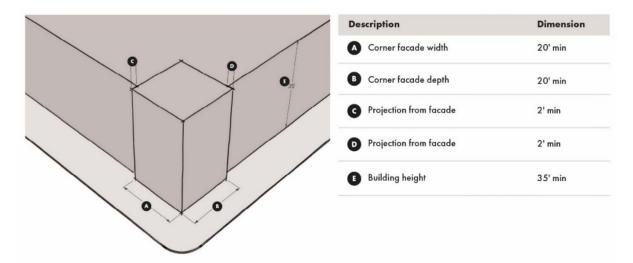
BB: CORNER LOWER THAN THE ROOF OF THE REST OF THE BUILDING
